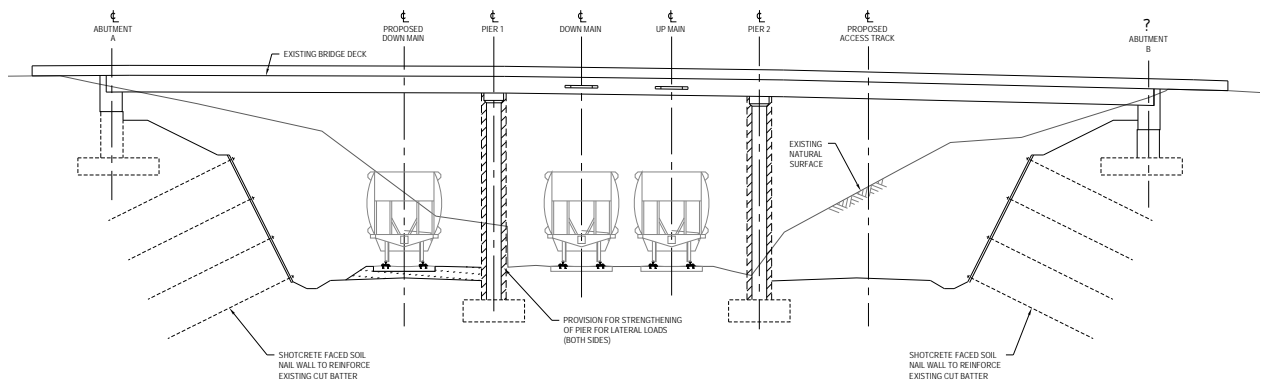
Proposed Modified Bridge Street Overbridge Design Schematic
